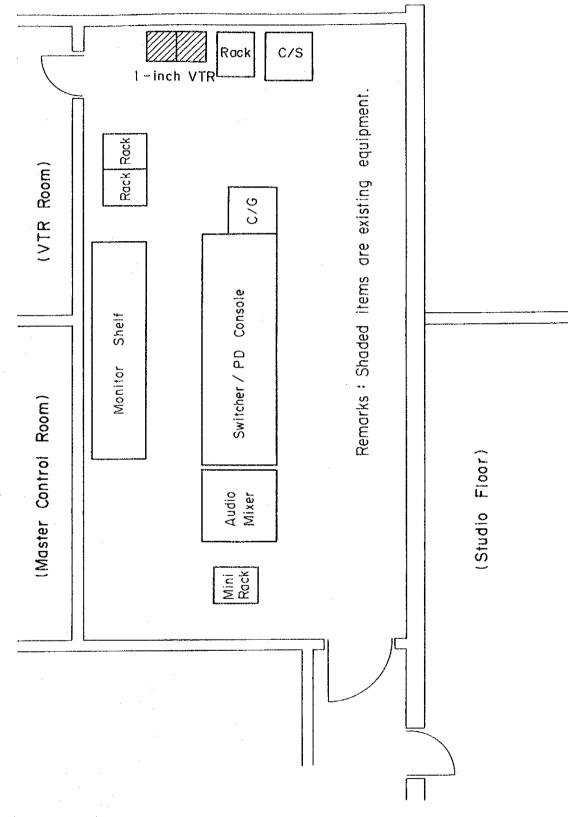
EQUIPMENT LAYOUT OF NEWS-CONTINUITY STUDIO
